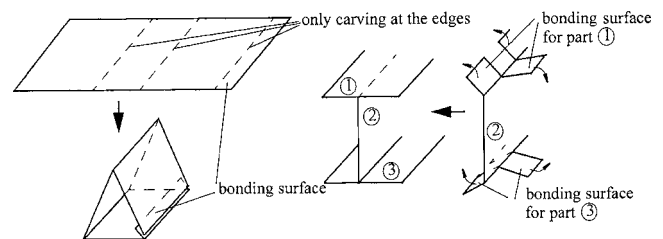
Examples that show the easy handling of cardboard. Member with boxed section (left) and open H section (right).
